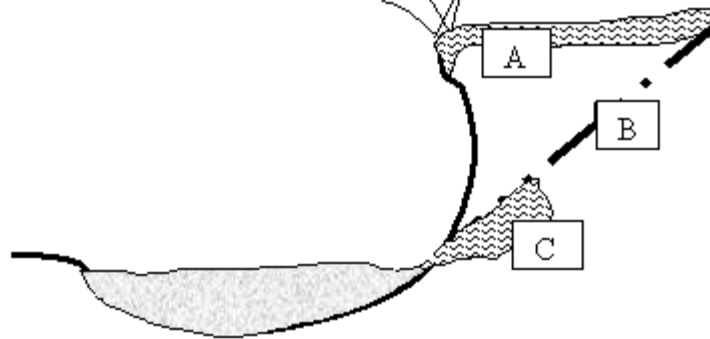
Conceptual approach to stabilizing vertical eroding banks.
